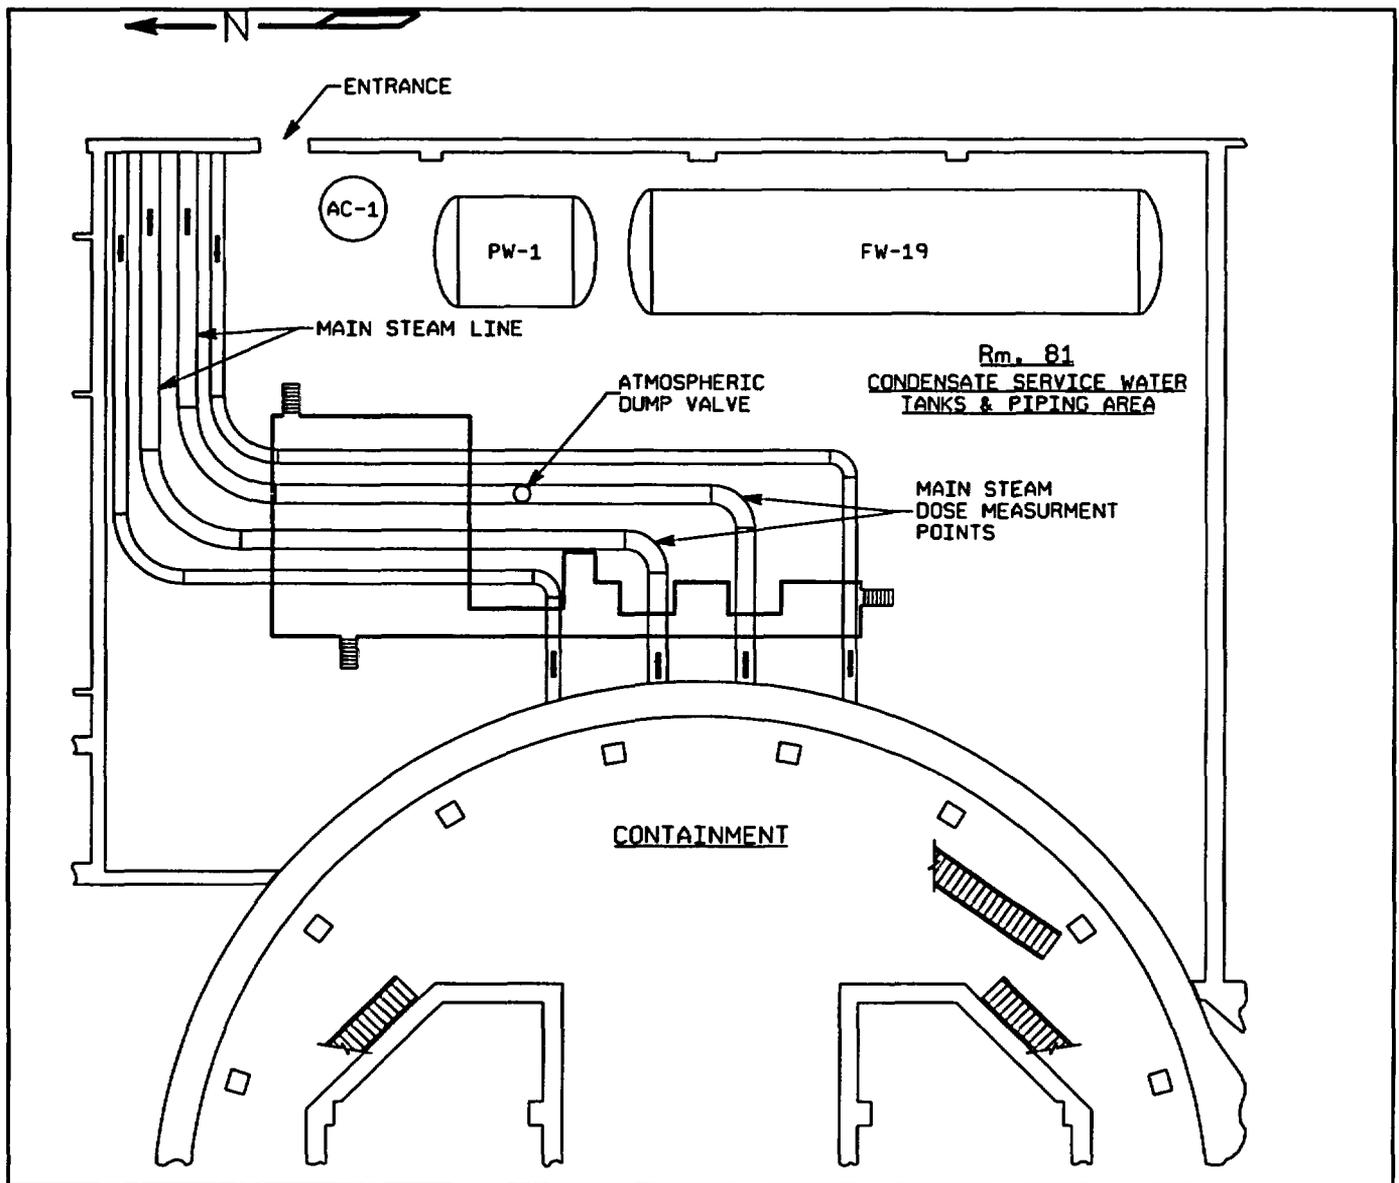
Auxiliary Building - Plant Elevation 1007'-0" & 1013'-0"
